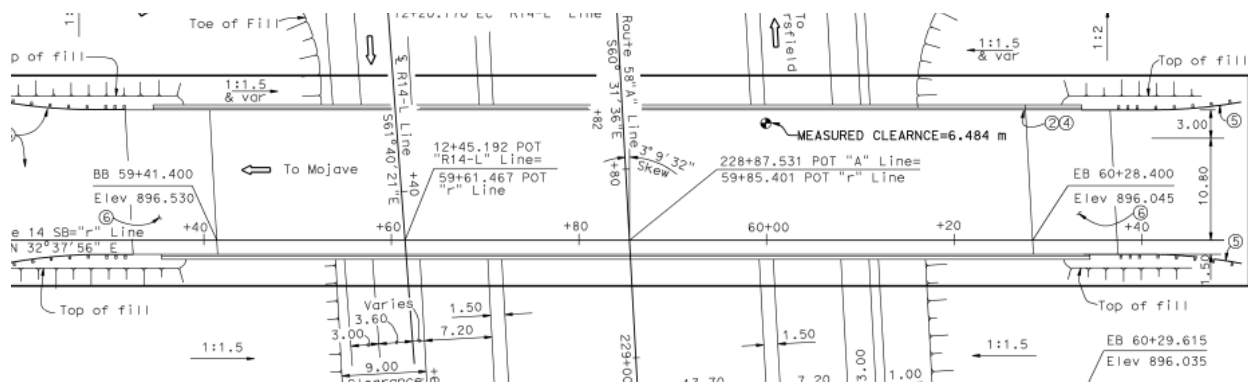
Schematic Plan view of R14R bridge (drawing provided by Caltrans)
